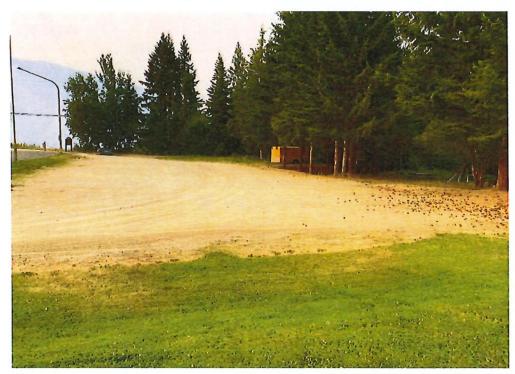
Existing Gravel Parking Lot - Facing East - Picture shows that the grades do not need to be majorly altered in order to expand the parking lot as per the proposal
